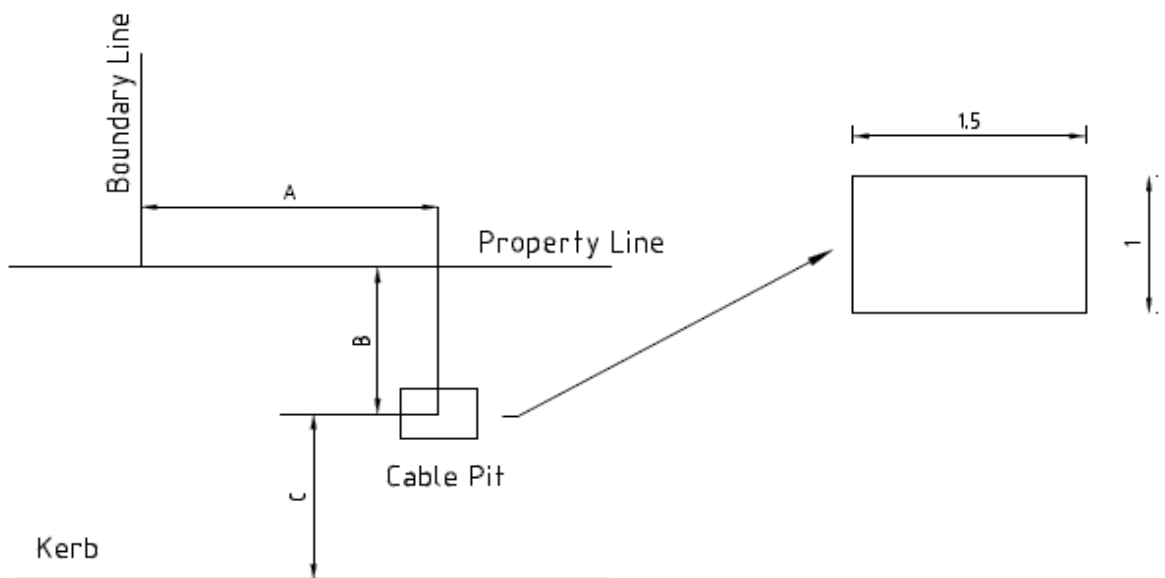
MEASUREMENT OPTIONS FOR LOCATING A CABLE BEND
